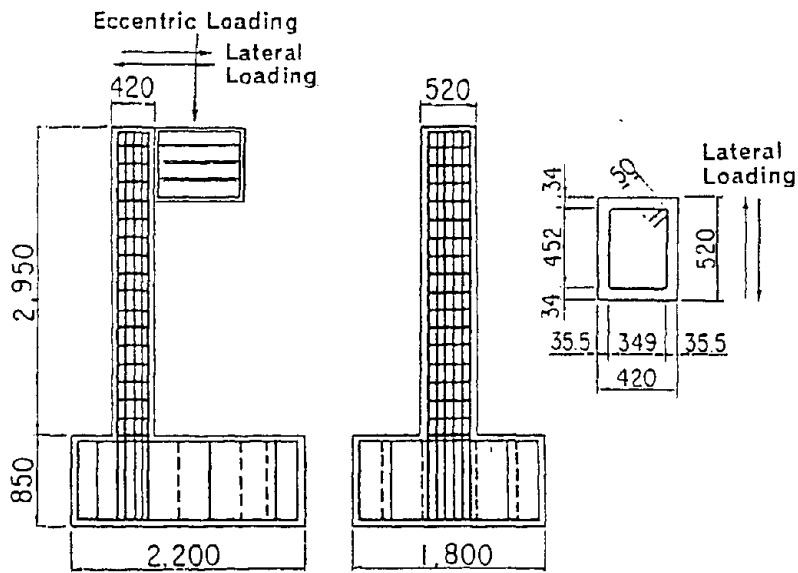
C–Shaped Bridge Pier Model for Dynamic Loading Tests
